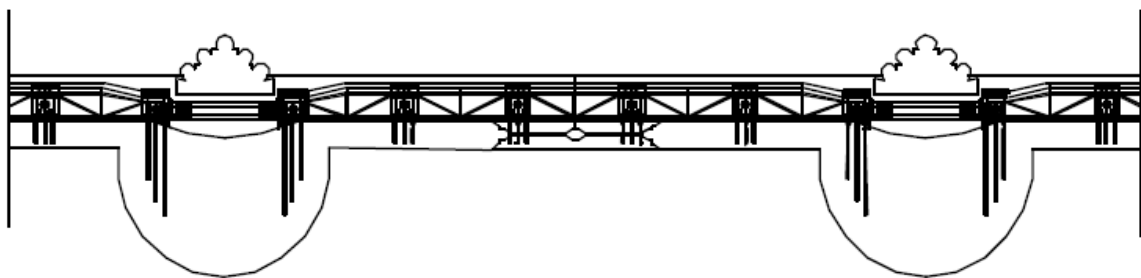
One bay of the steel beam with couples of STU at each end
